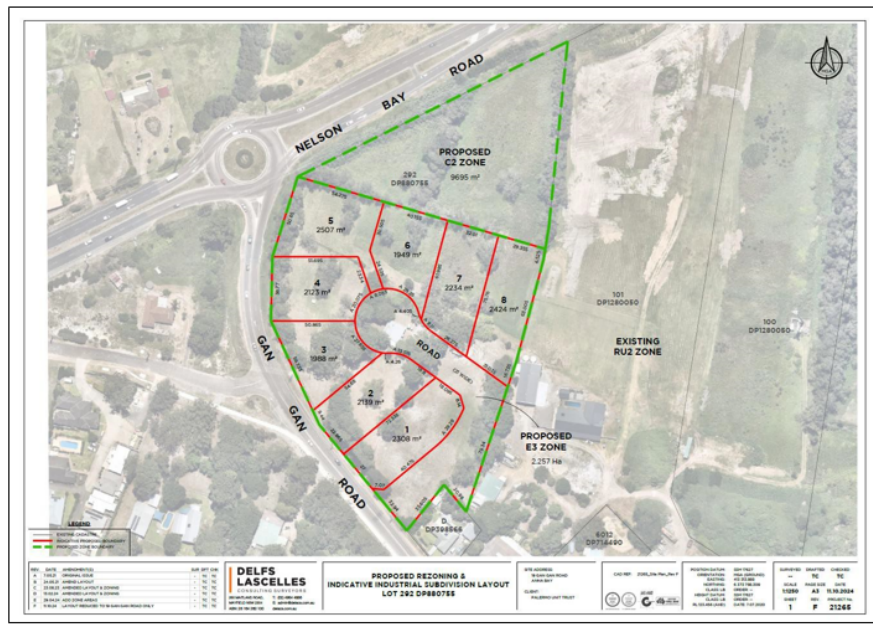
Indicative concept subdivision layout (subject to development consent)
